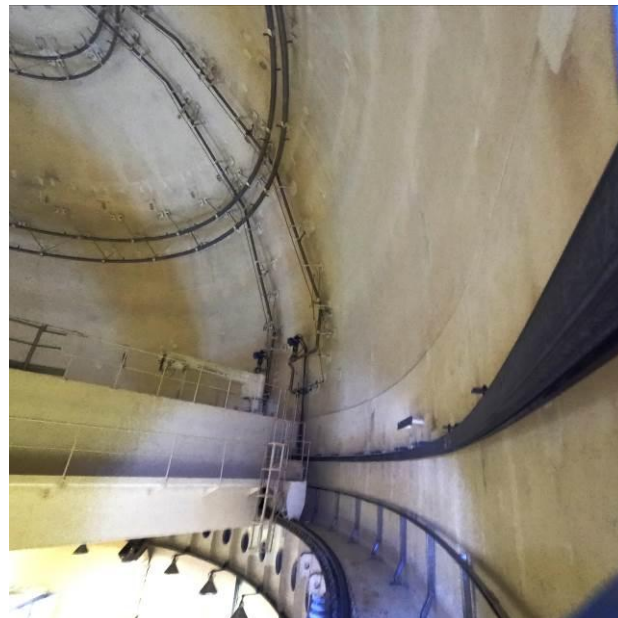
Inside of the containment dome. Inspection can be performed along the whole circumference (polar crane girder) and from the polar crane itself.
